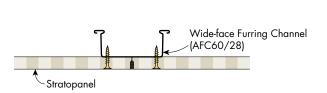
Short Edges - UFF Joint Stratopanel using Wide-face Furring Channel Section
